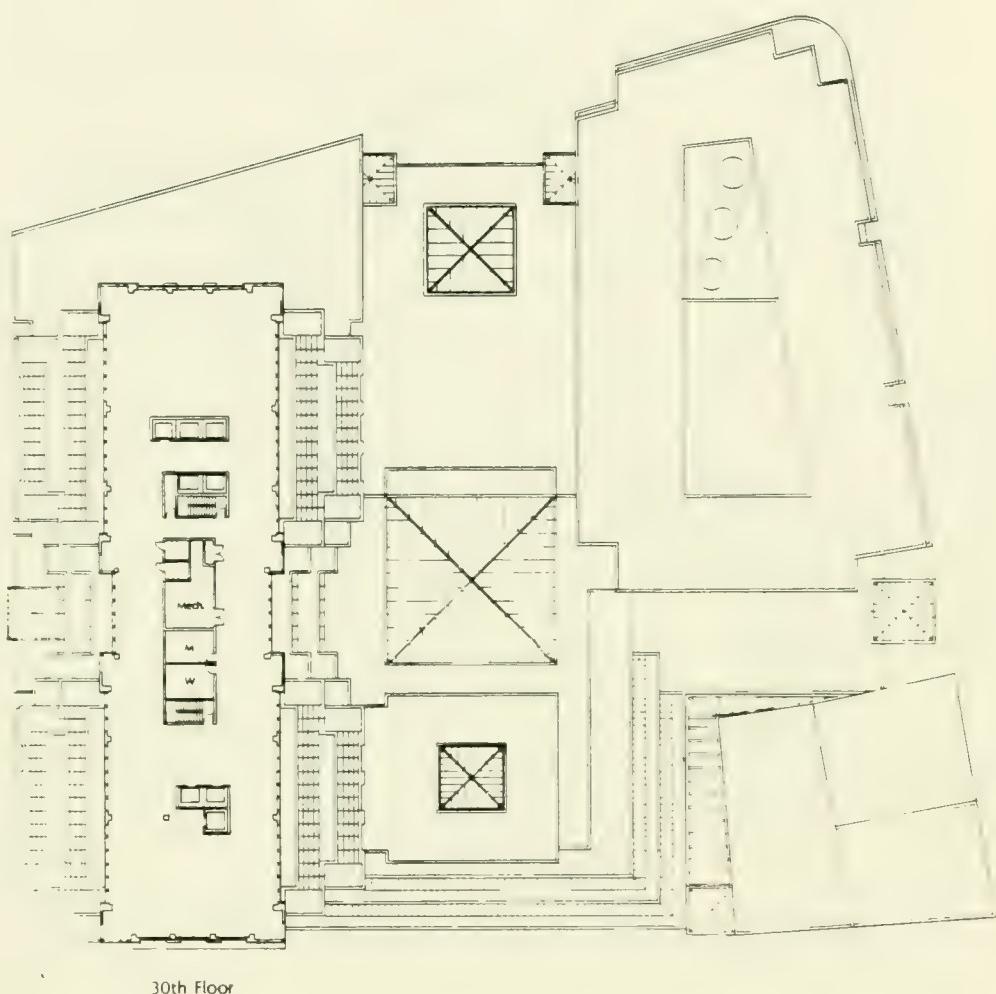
HIGH RISE FLOORS - 30TH FLOOR
